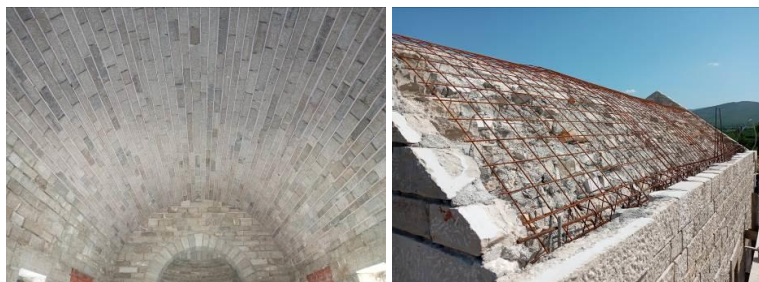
Reinforcement of the masonry vault with RC shell layer (photo: P. Petronijević)
